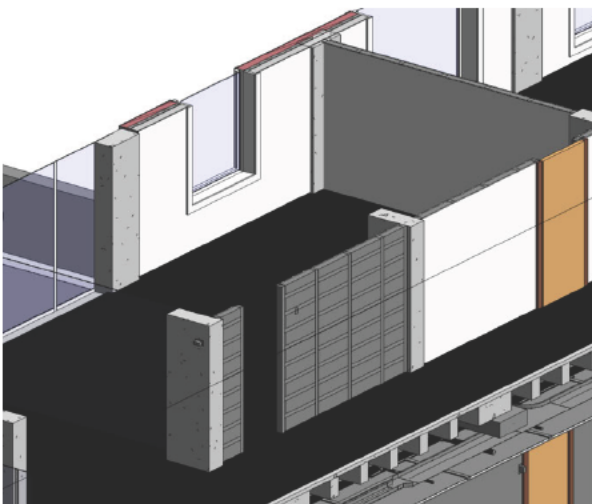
Internal walls modelled using metal studs and rock wool insulation
